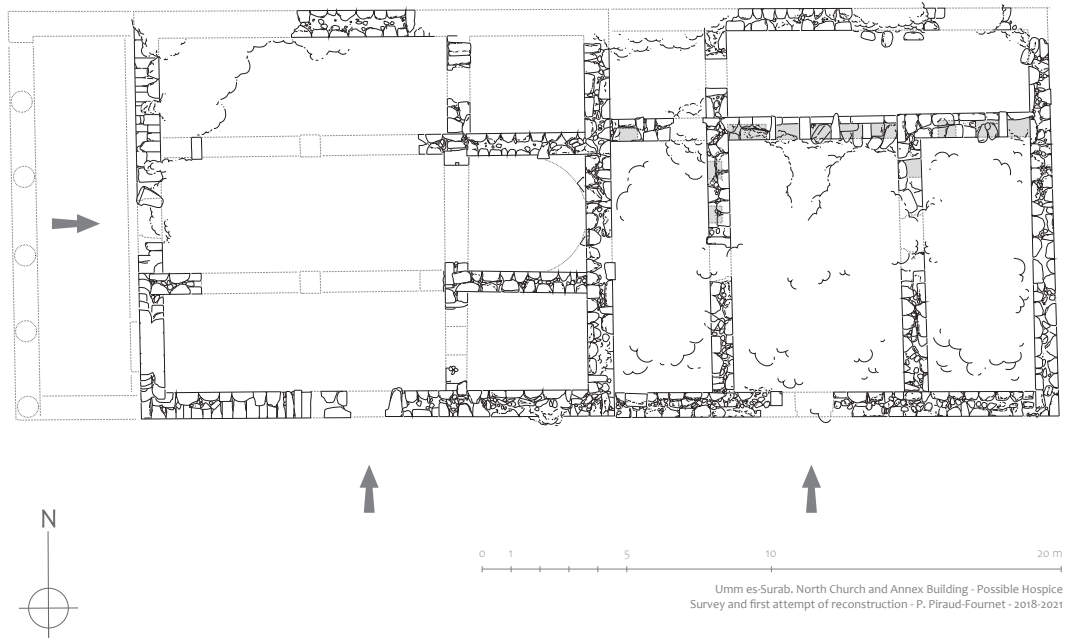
Umm es-Surab. Annex Building of the Northern Church. Plan and first attempt of reconstruction. © P. Piraud-Fournet 2022
